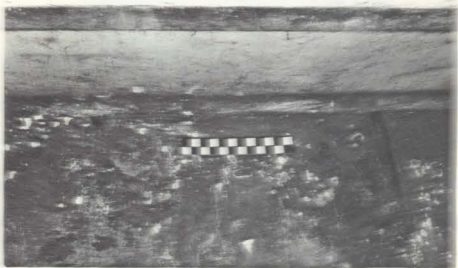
Small deteriorated areas on west wall on of all the floorboards. The damage caused by water rot on the west half of the floor. As can be seen in Figure 22, this rot has progressed through both layers of flooring in a large area.
